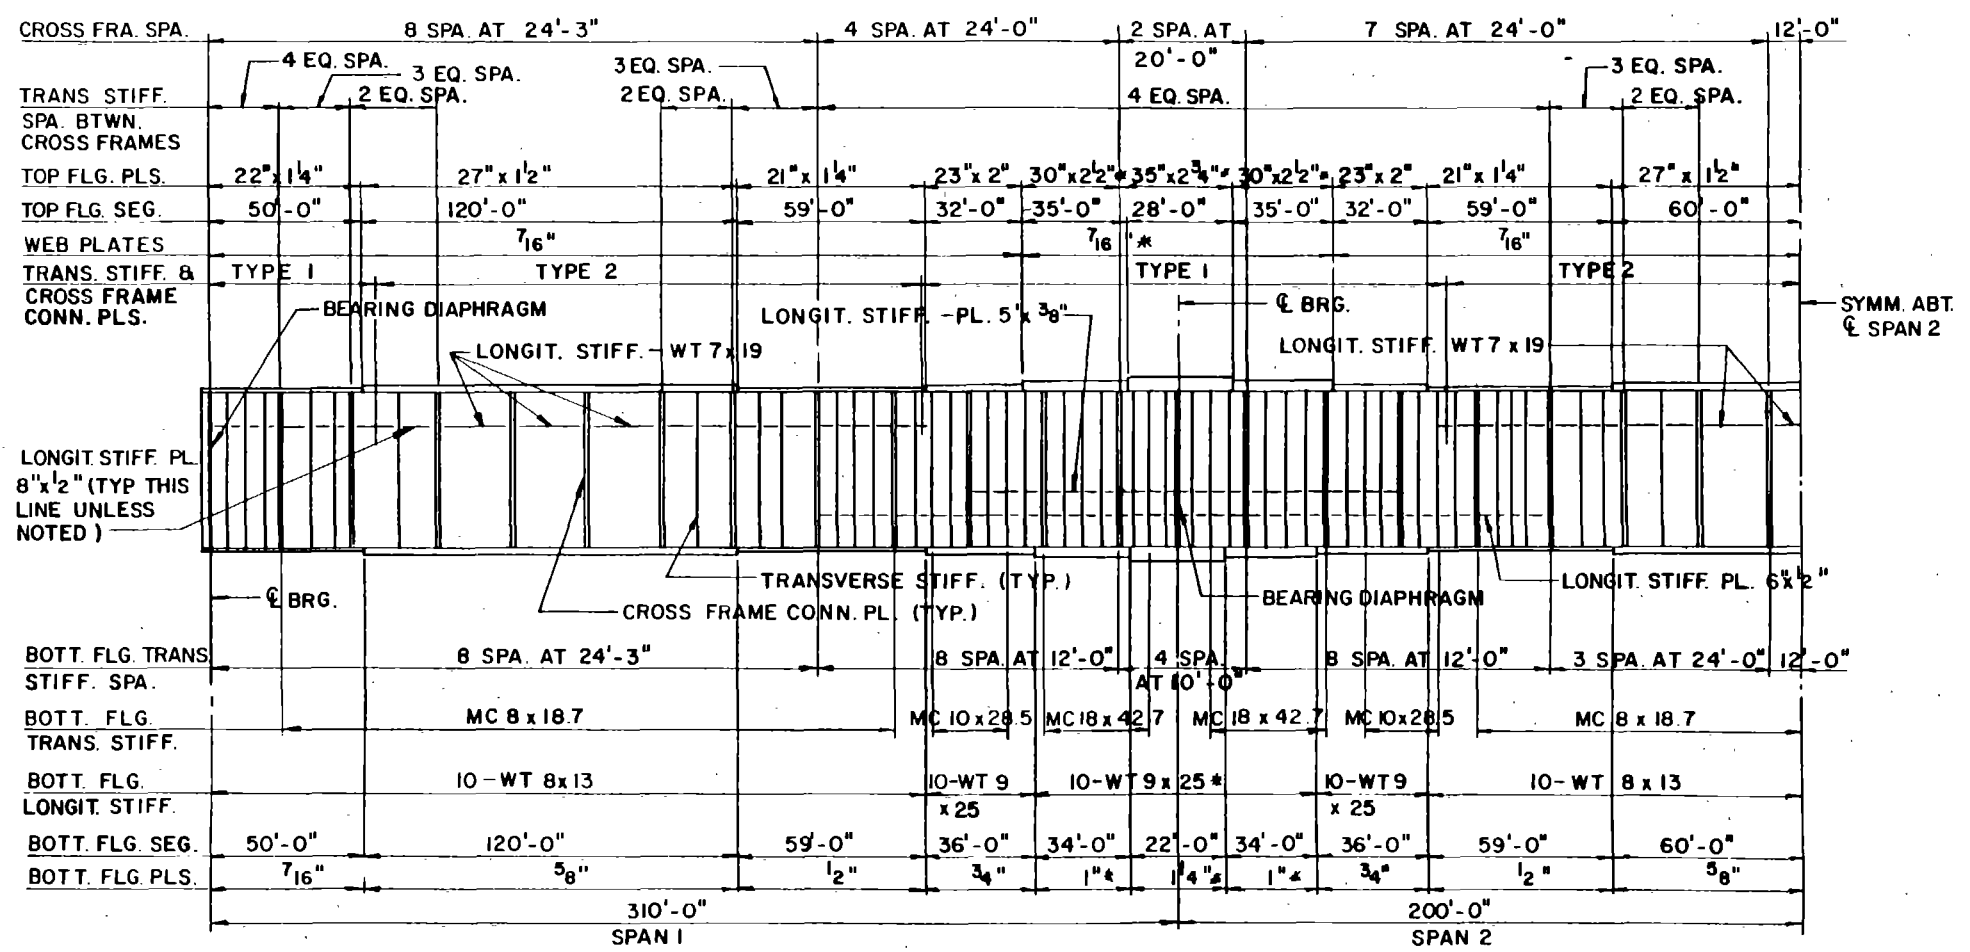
INTERIOR ELEVATION OF TYPICAL GIRDER WEB - PROPOSED SPECIFICATION SHORT SPAN
